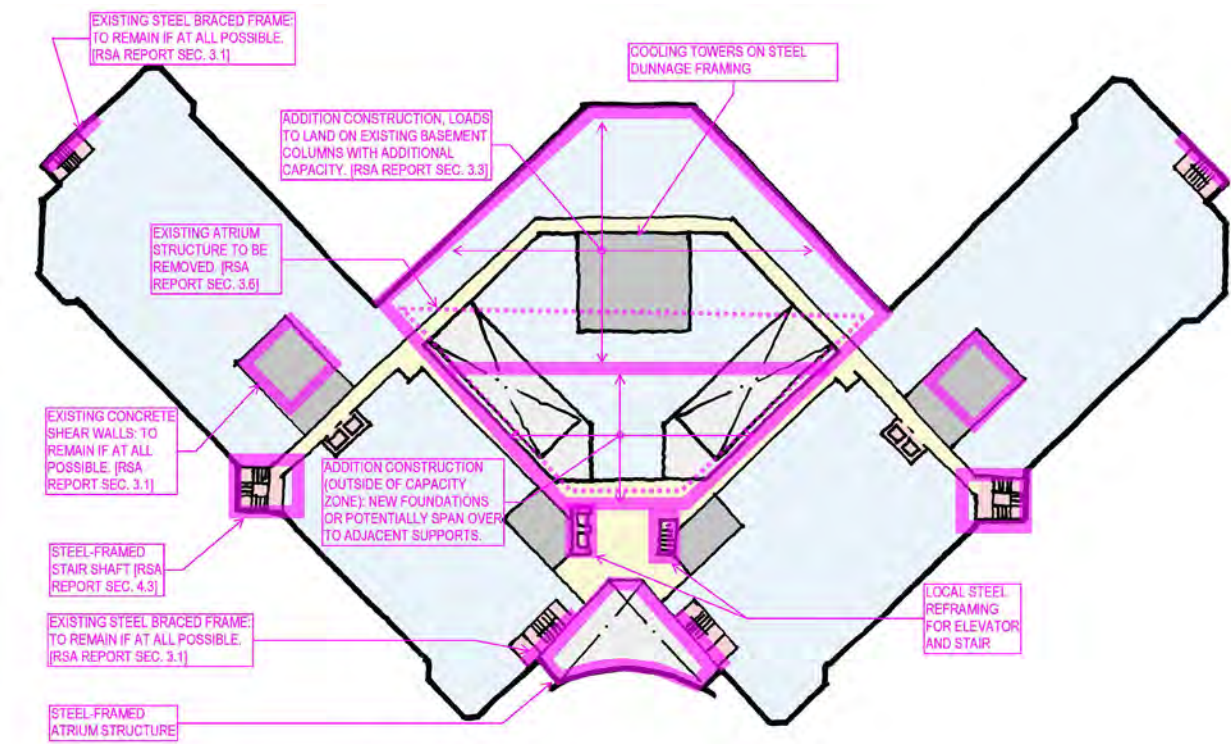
Recommendation Scheme Structural Markups – 4th Floor Plan
